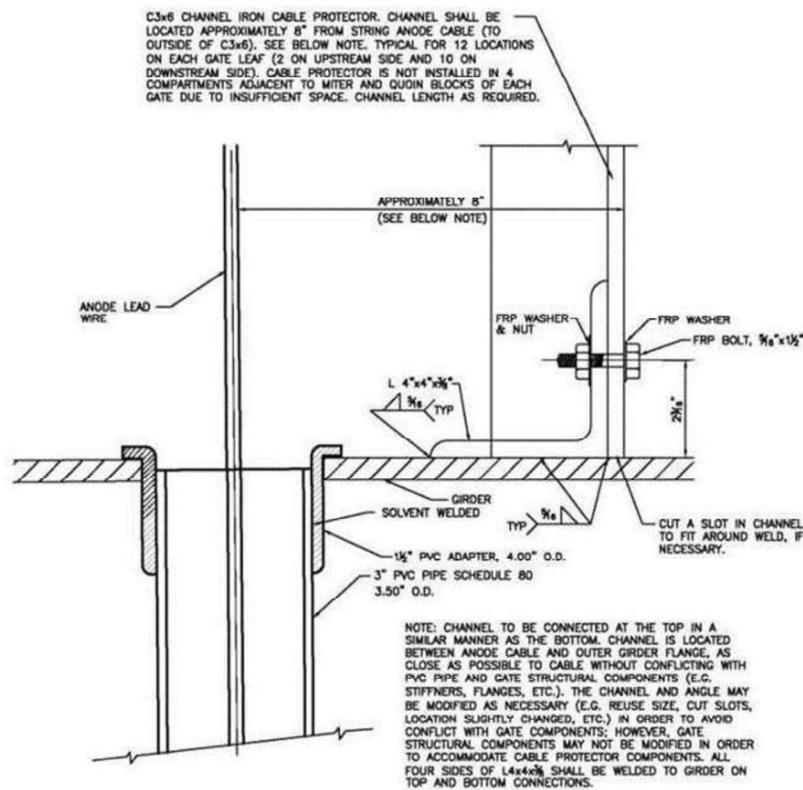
Anode Protection Pipe Upper Girder Termination
